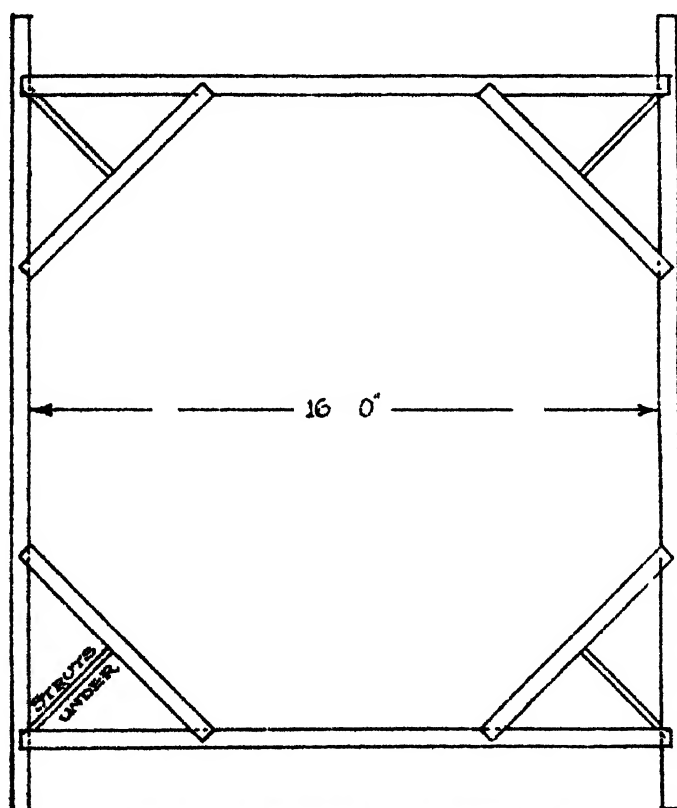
Plan of Top Plates for Roof of Octagonal Silo.
